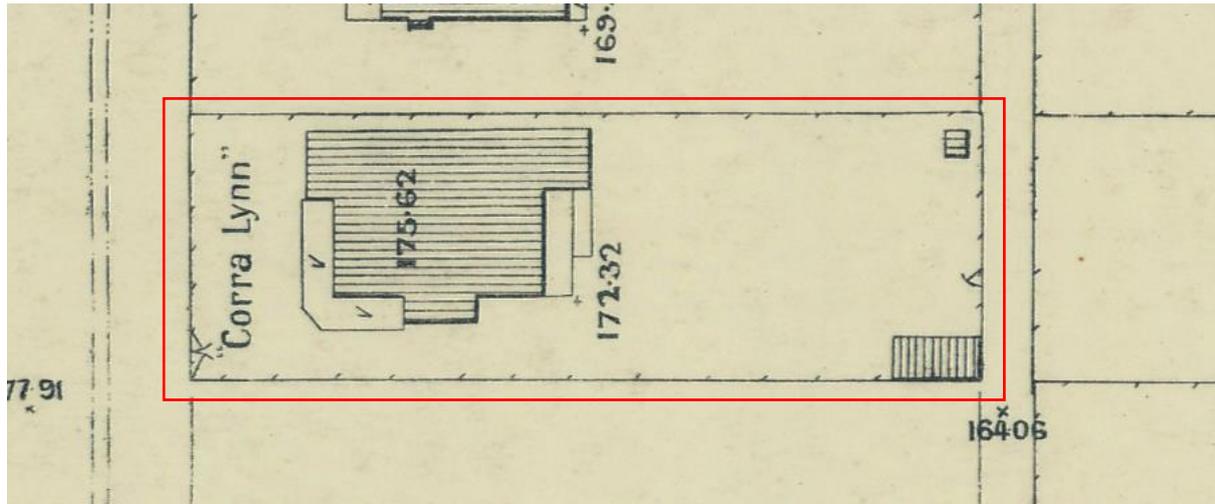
Detail from Melbourne and Metropolitan Board of Works detail plan No. 2954, Municipality of Camberwell, 1926. (Source: State Library Victoria, with GML overlay)
